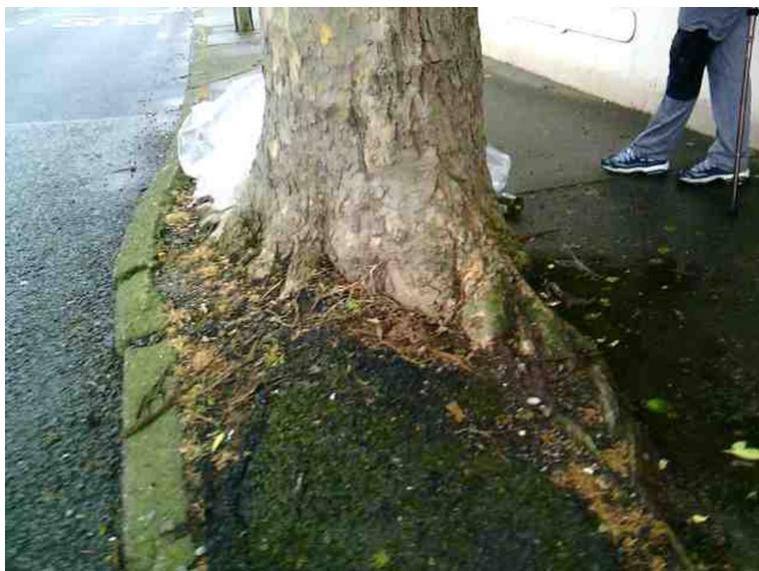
Base of London plane within paving on Whitehall Road. Note bulging of kerbing and verge
